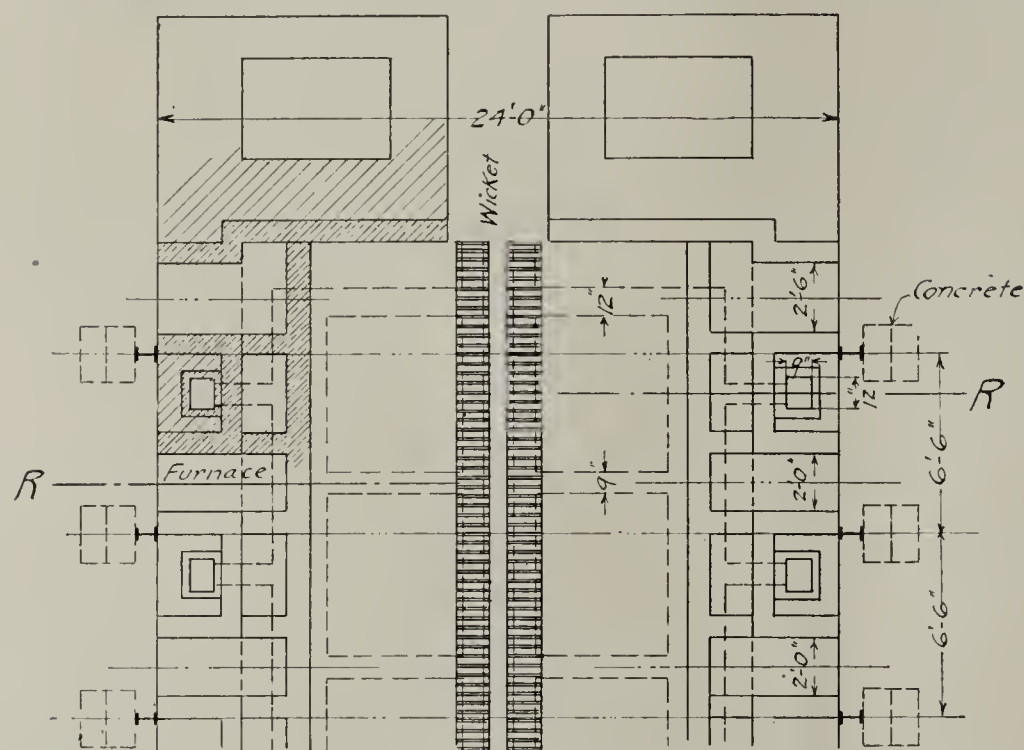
Plan View of Rectangular Kiln, Giving Construction Details and Dimensions.
